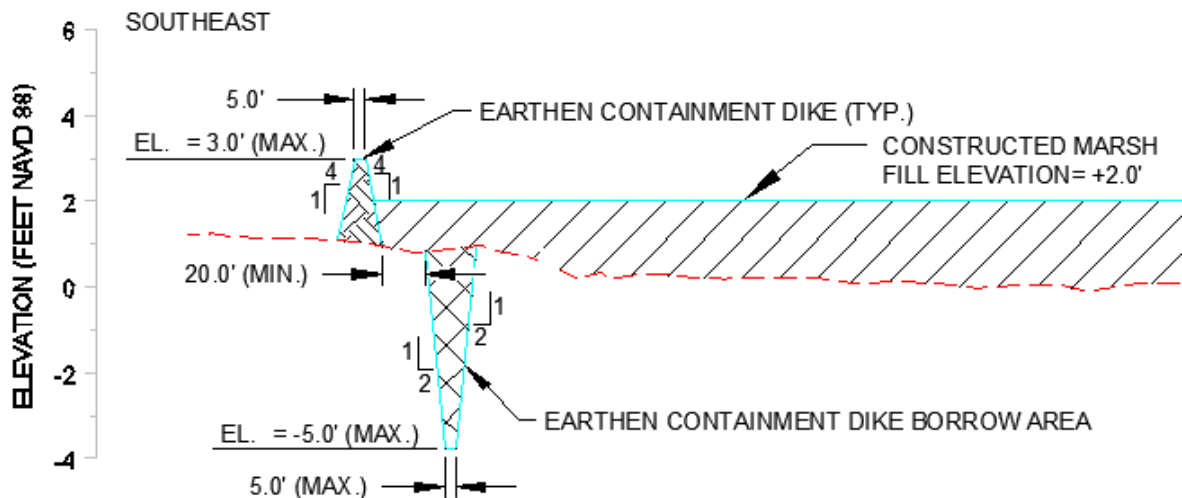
Typical earthen containment dike section for Marsh Creation Fill Areas 1&2.
